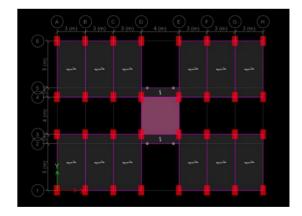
Plan of G+30 story RCC building (22 m x 16 m)
